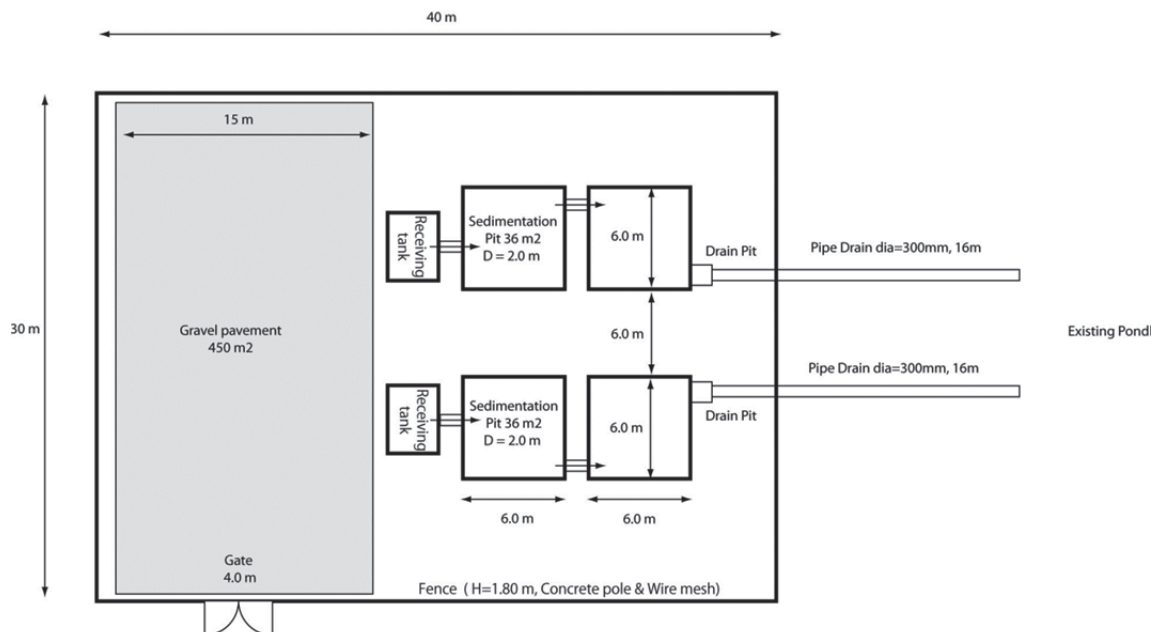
Layout of the treatment facility for the sludge from septic tanks
